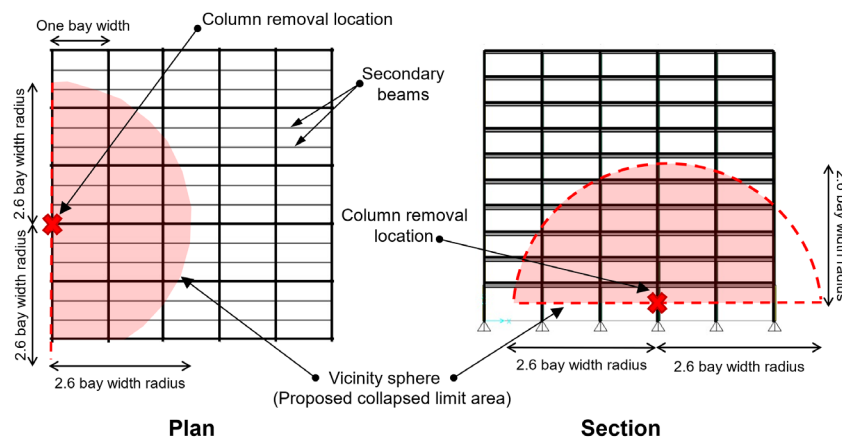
Extended area for the collapsed limit proposed in this study.
